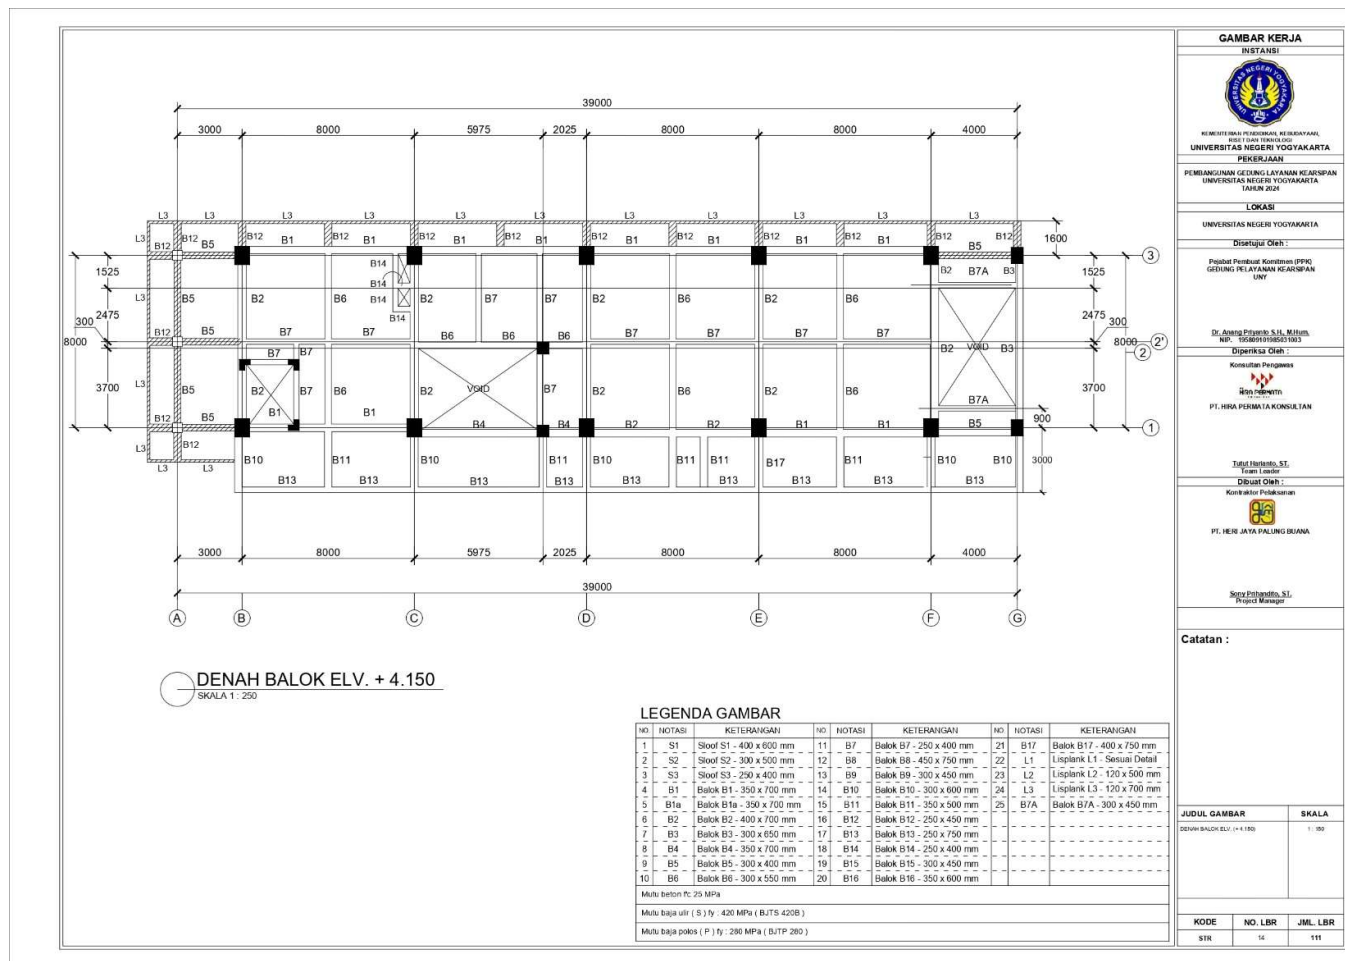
6 Beam Site Plan of Elv. +4.150
